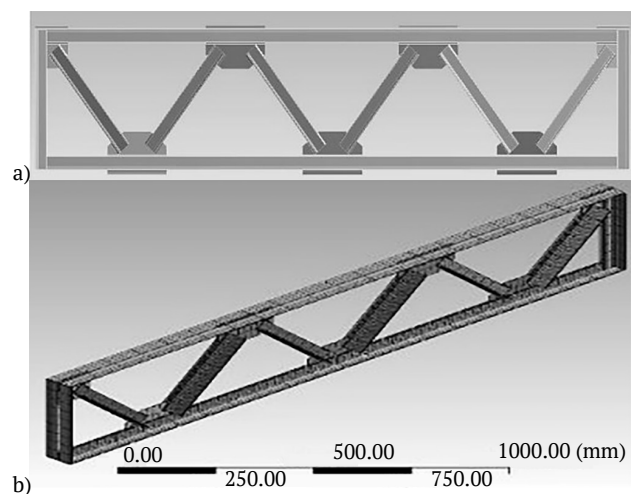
Truss model in the ANSYS Workbench 14.5 environment
